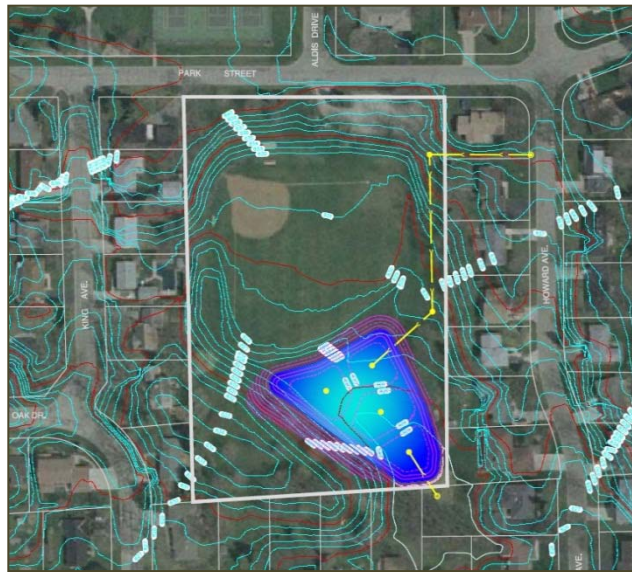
Potential bioretention project location in Lions Park, East Dundee.
